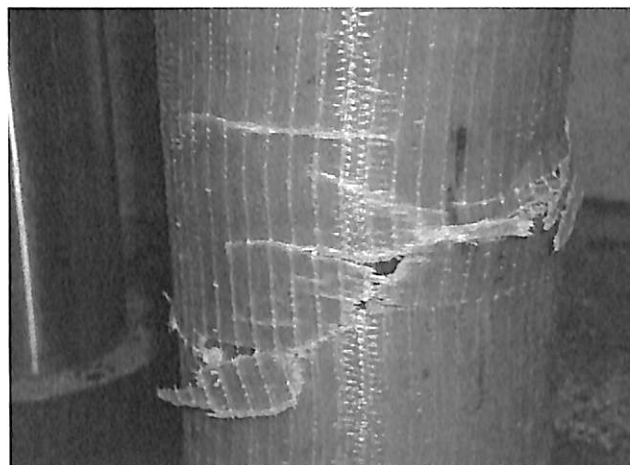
Fiber Rupture of Core-repaired Timber Piles with Transverse and Longitudinal Reinforcement
